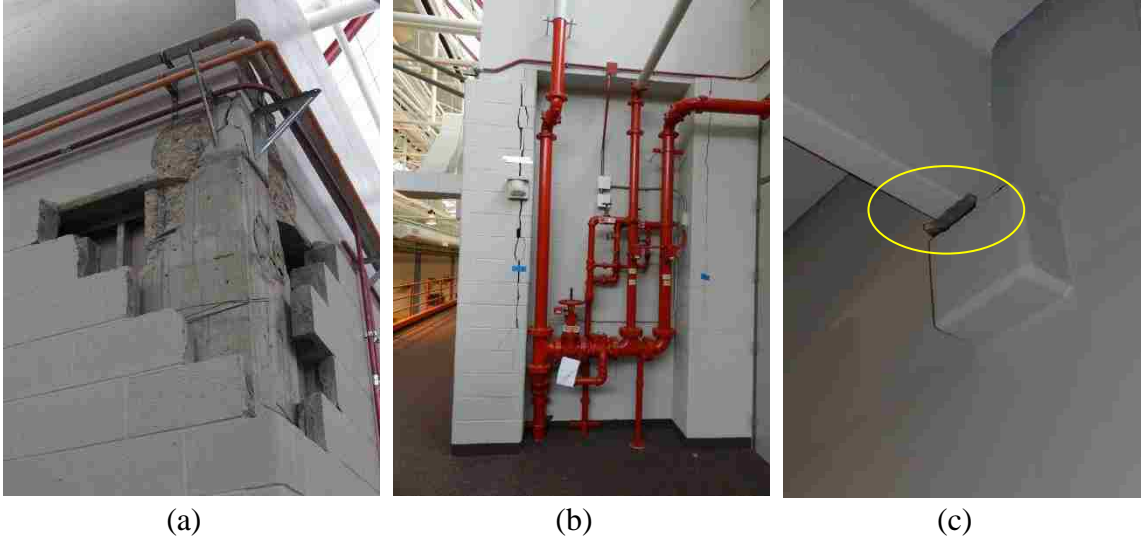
(a) RC beam-column joint failure; (b) crack in masonry wall; (c) sliding of T beams
